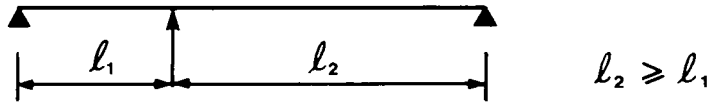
(e) COTTESMORE FOOTBRIDGE, Post tensioned concrete, part voided, cantilever and suspended span
